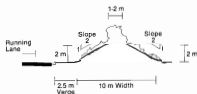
DETAILS OF TYPICAL EARTH MOUND.
